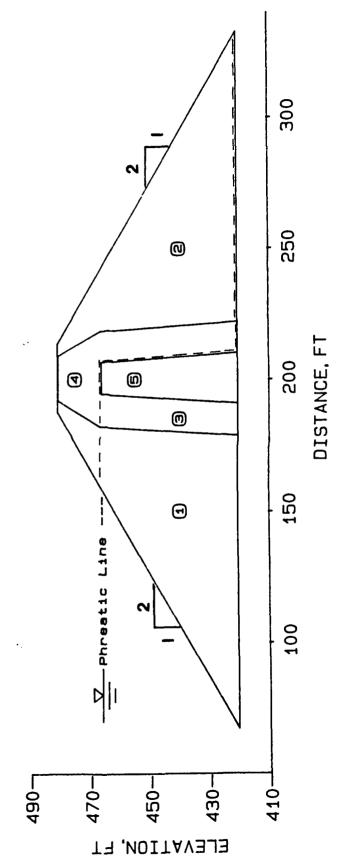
Idealized embankment section of Mormon Island Dam founded on rock and developed from cross section of dam at sta 426+00
